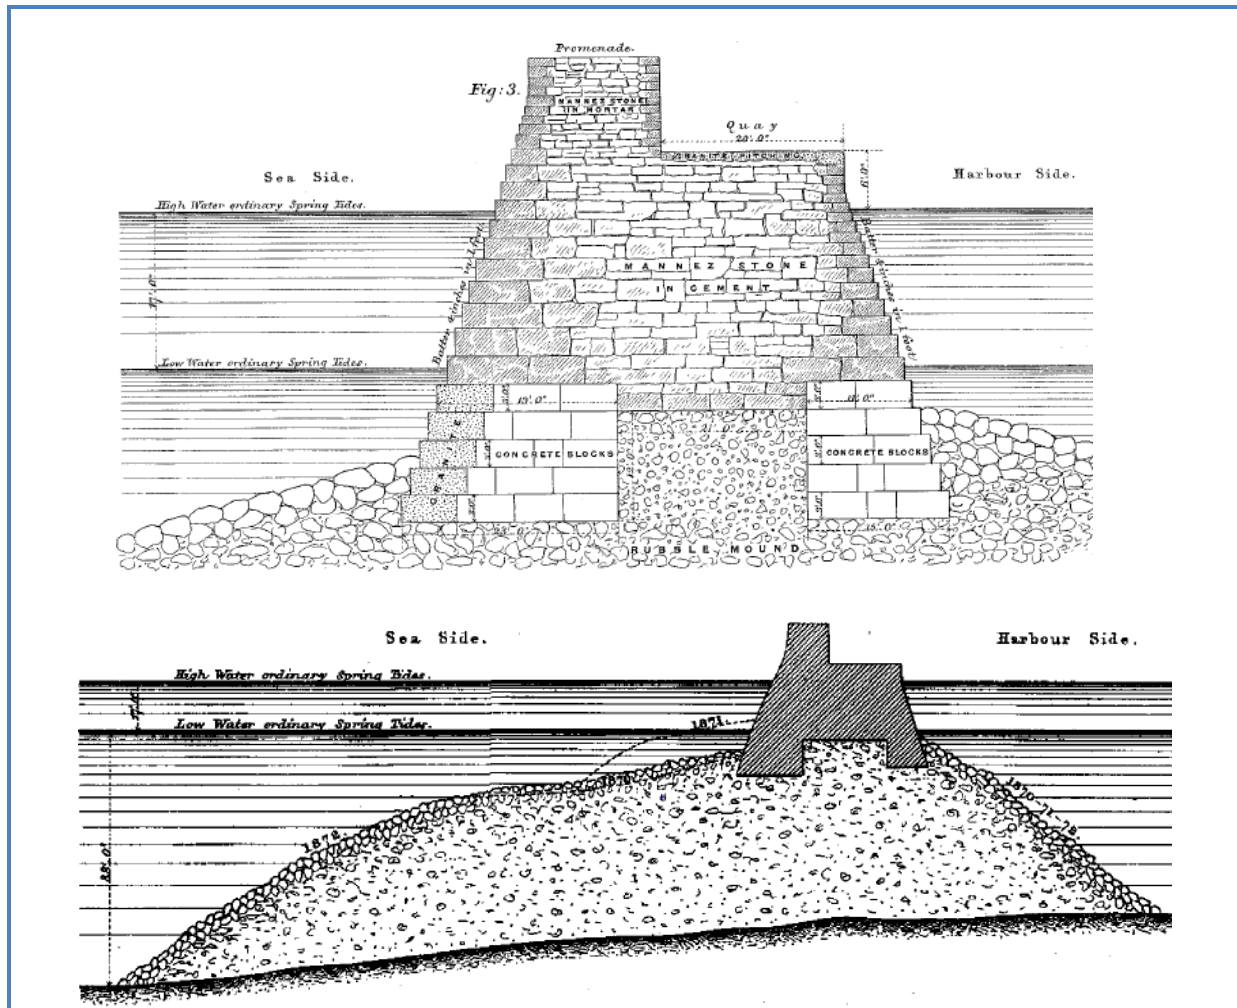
Sections of mound and breakwater wall, Alderney. Note extended mound from addition of stone dumped down the seaward face of the wall. (Source: Vernon Harcourt, 1873)
